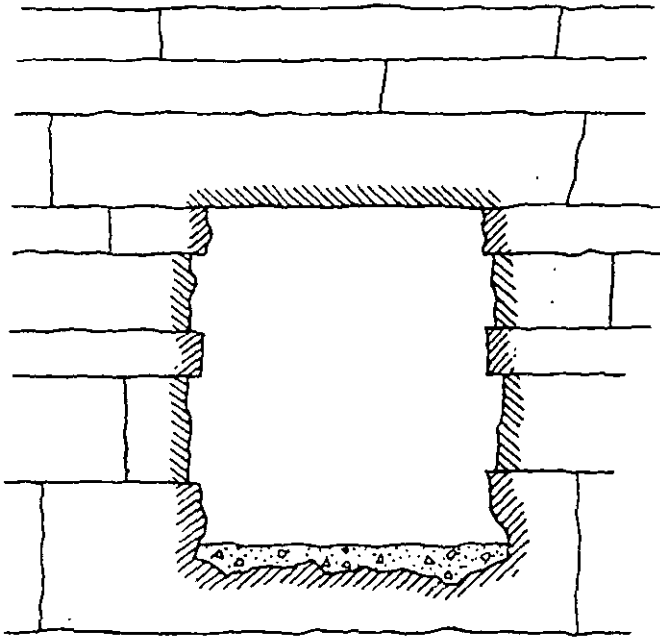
b Bridge action in rocks with widely spaced transverse joints.
